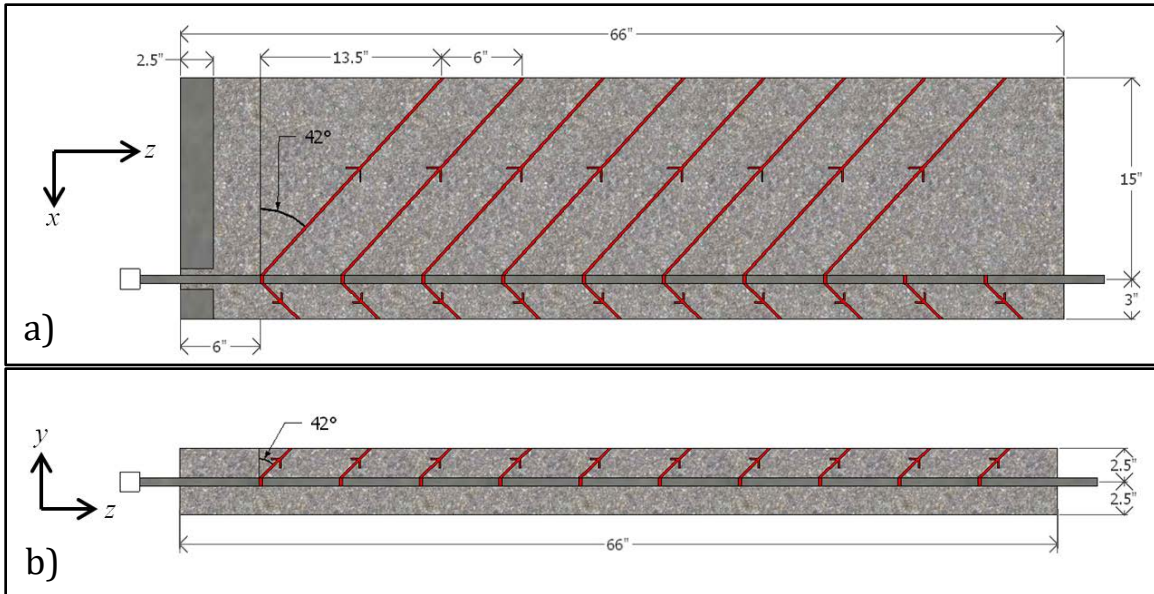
Cross sections at steel bar location in a) x-z plane, and b) y-z plane (Specimen set 2).
